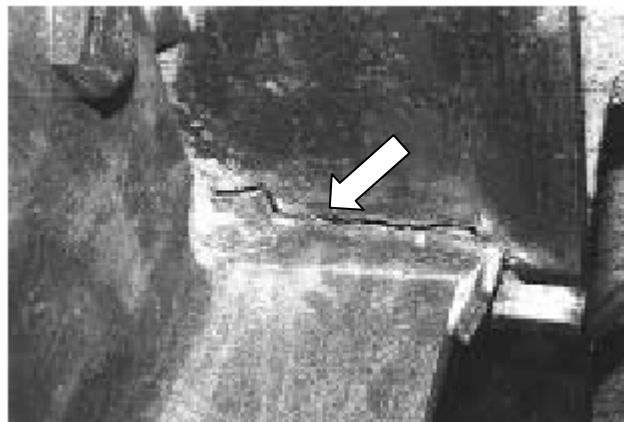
Fractured welded beam flange to column flange connection in building discovered following the 1994 Northridge earthquake
